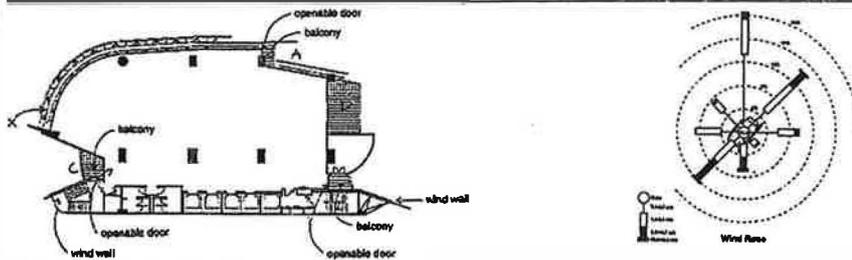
Typical office floor plan with the openings identified and wind rose for site.
